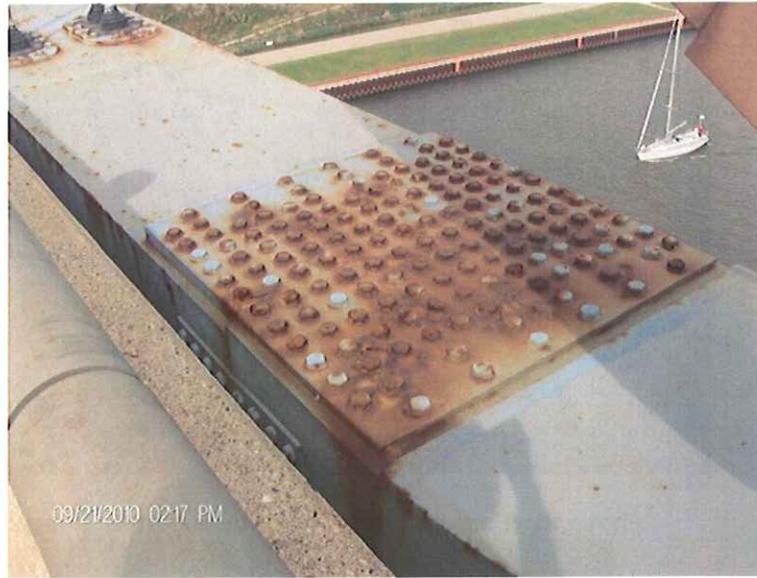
Tie girder - typical top flange corrosion at splice and cable covers
